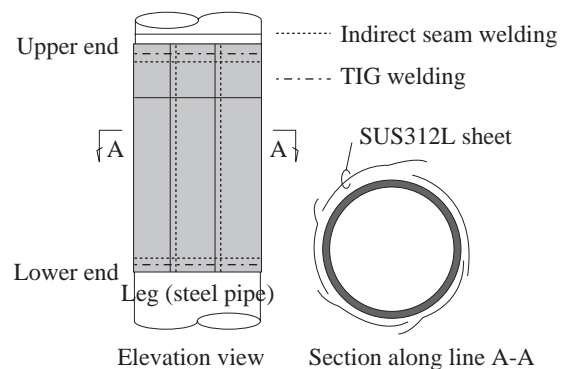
Example of sheathing of tubular member with SUS 312L sheets
